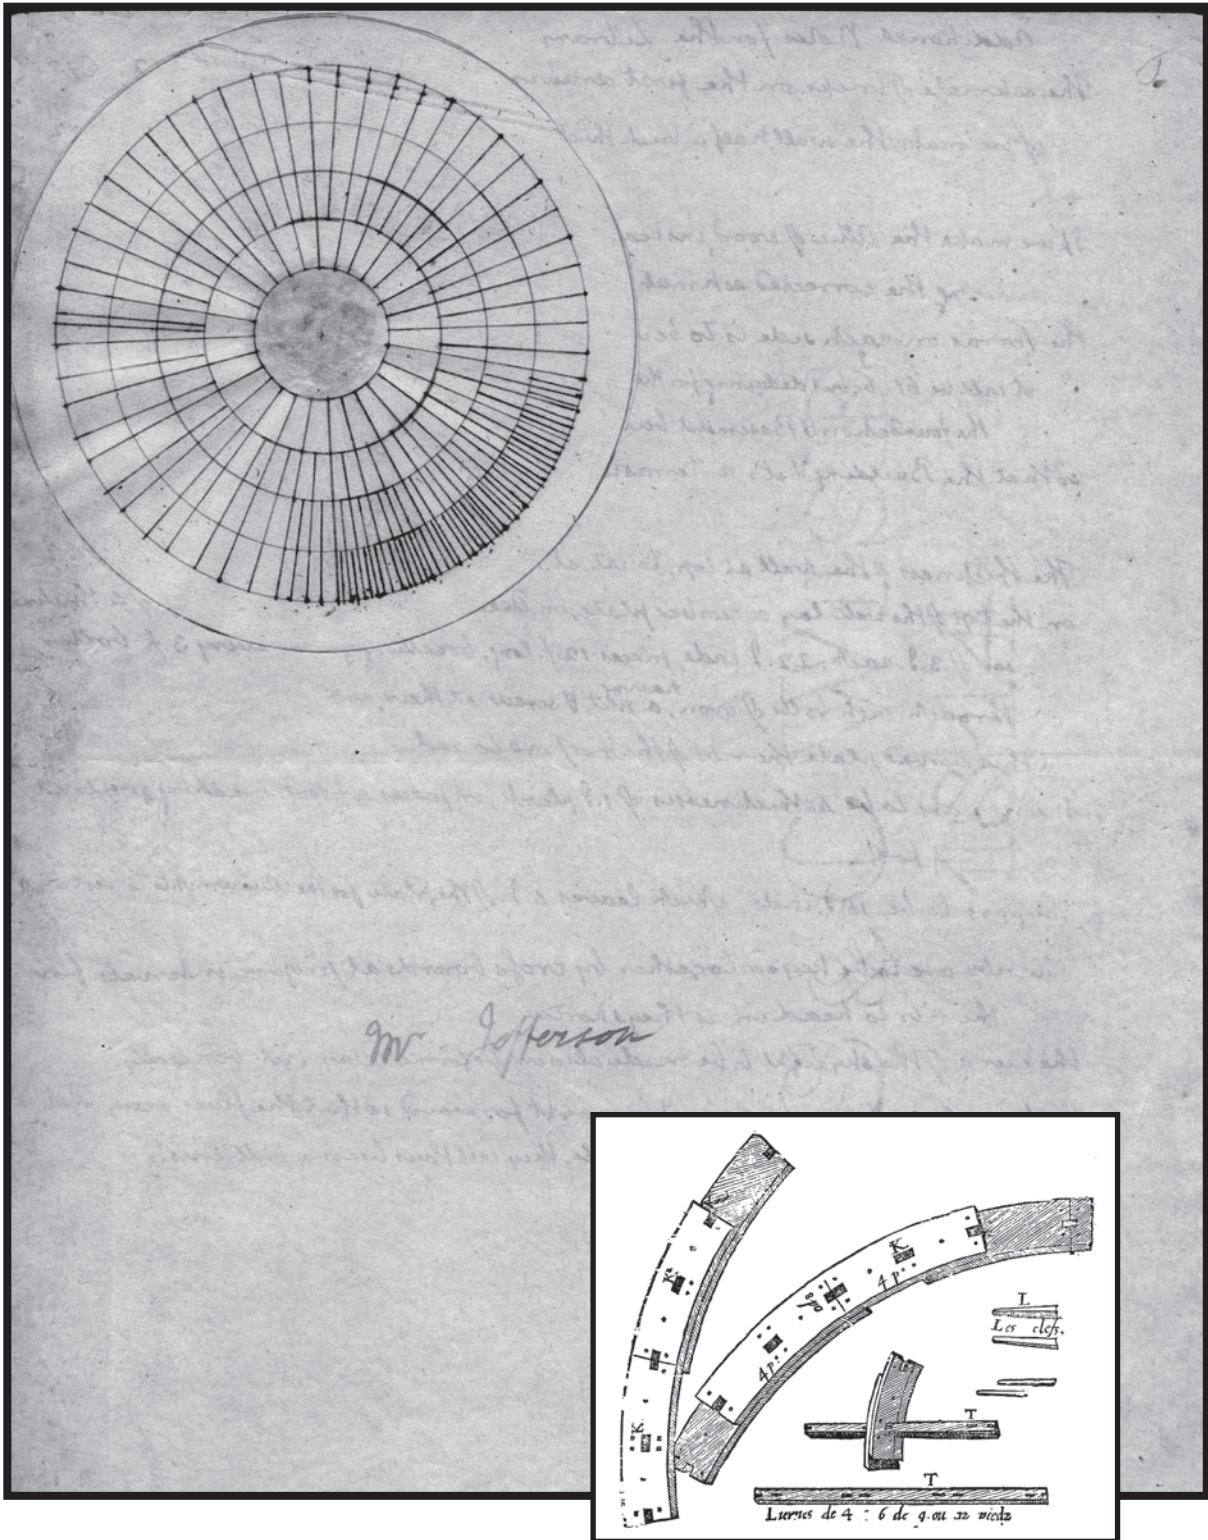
Thomas Jefferson, framing plan for the dome of the Rotunda.
